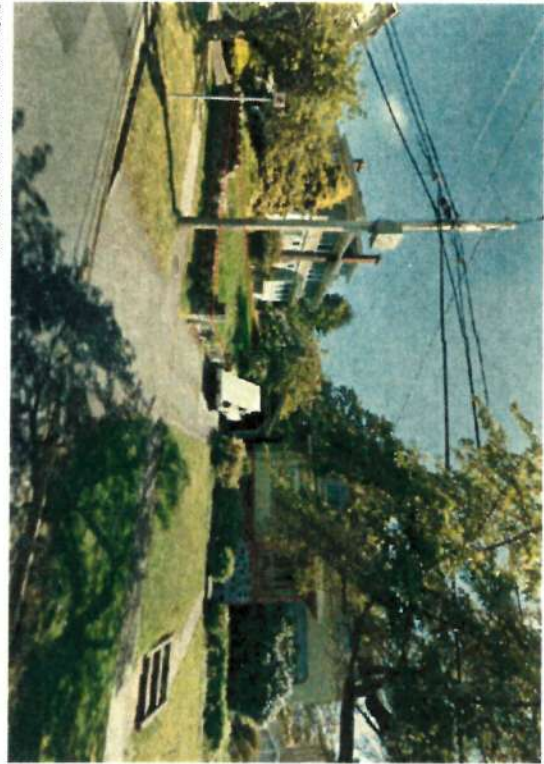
OF PROPOSED LOT LOOKING NORTH FROM MOSS STREET WITH JUNKY OF EXISTING SIDE YARD WALLS
